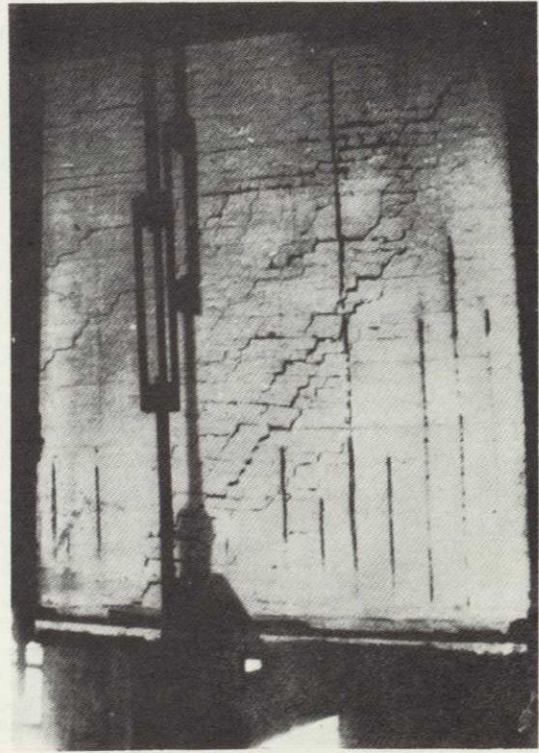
Rahmen structure with brick wall and an opening, load added to the breaking point
